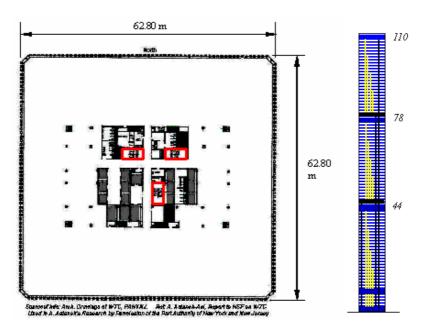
A sample of typical floor plans of the World Trade Center and view of elevators
